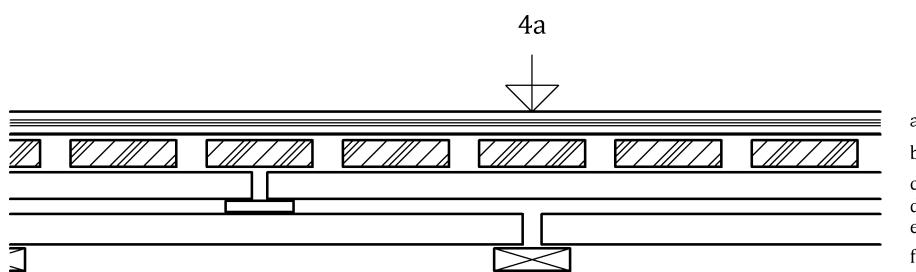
Area-elastic sports floor with elastic construction (beam, consisting of two parallel one upon another battens, support non-staggered)
